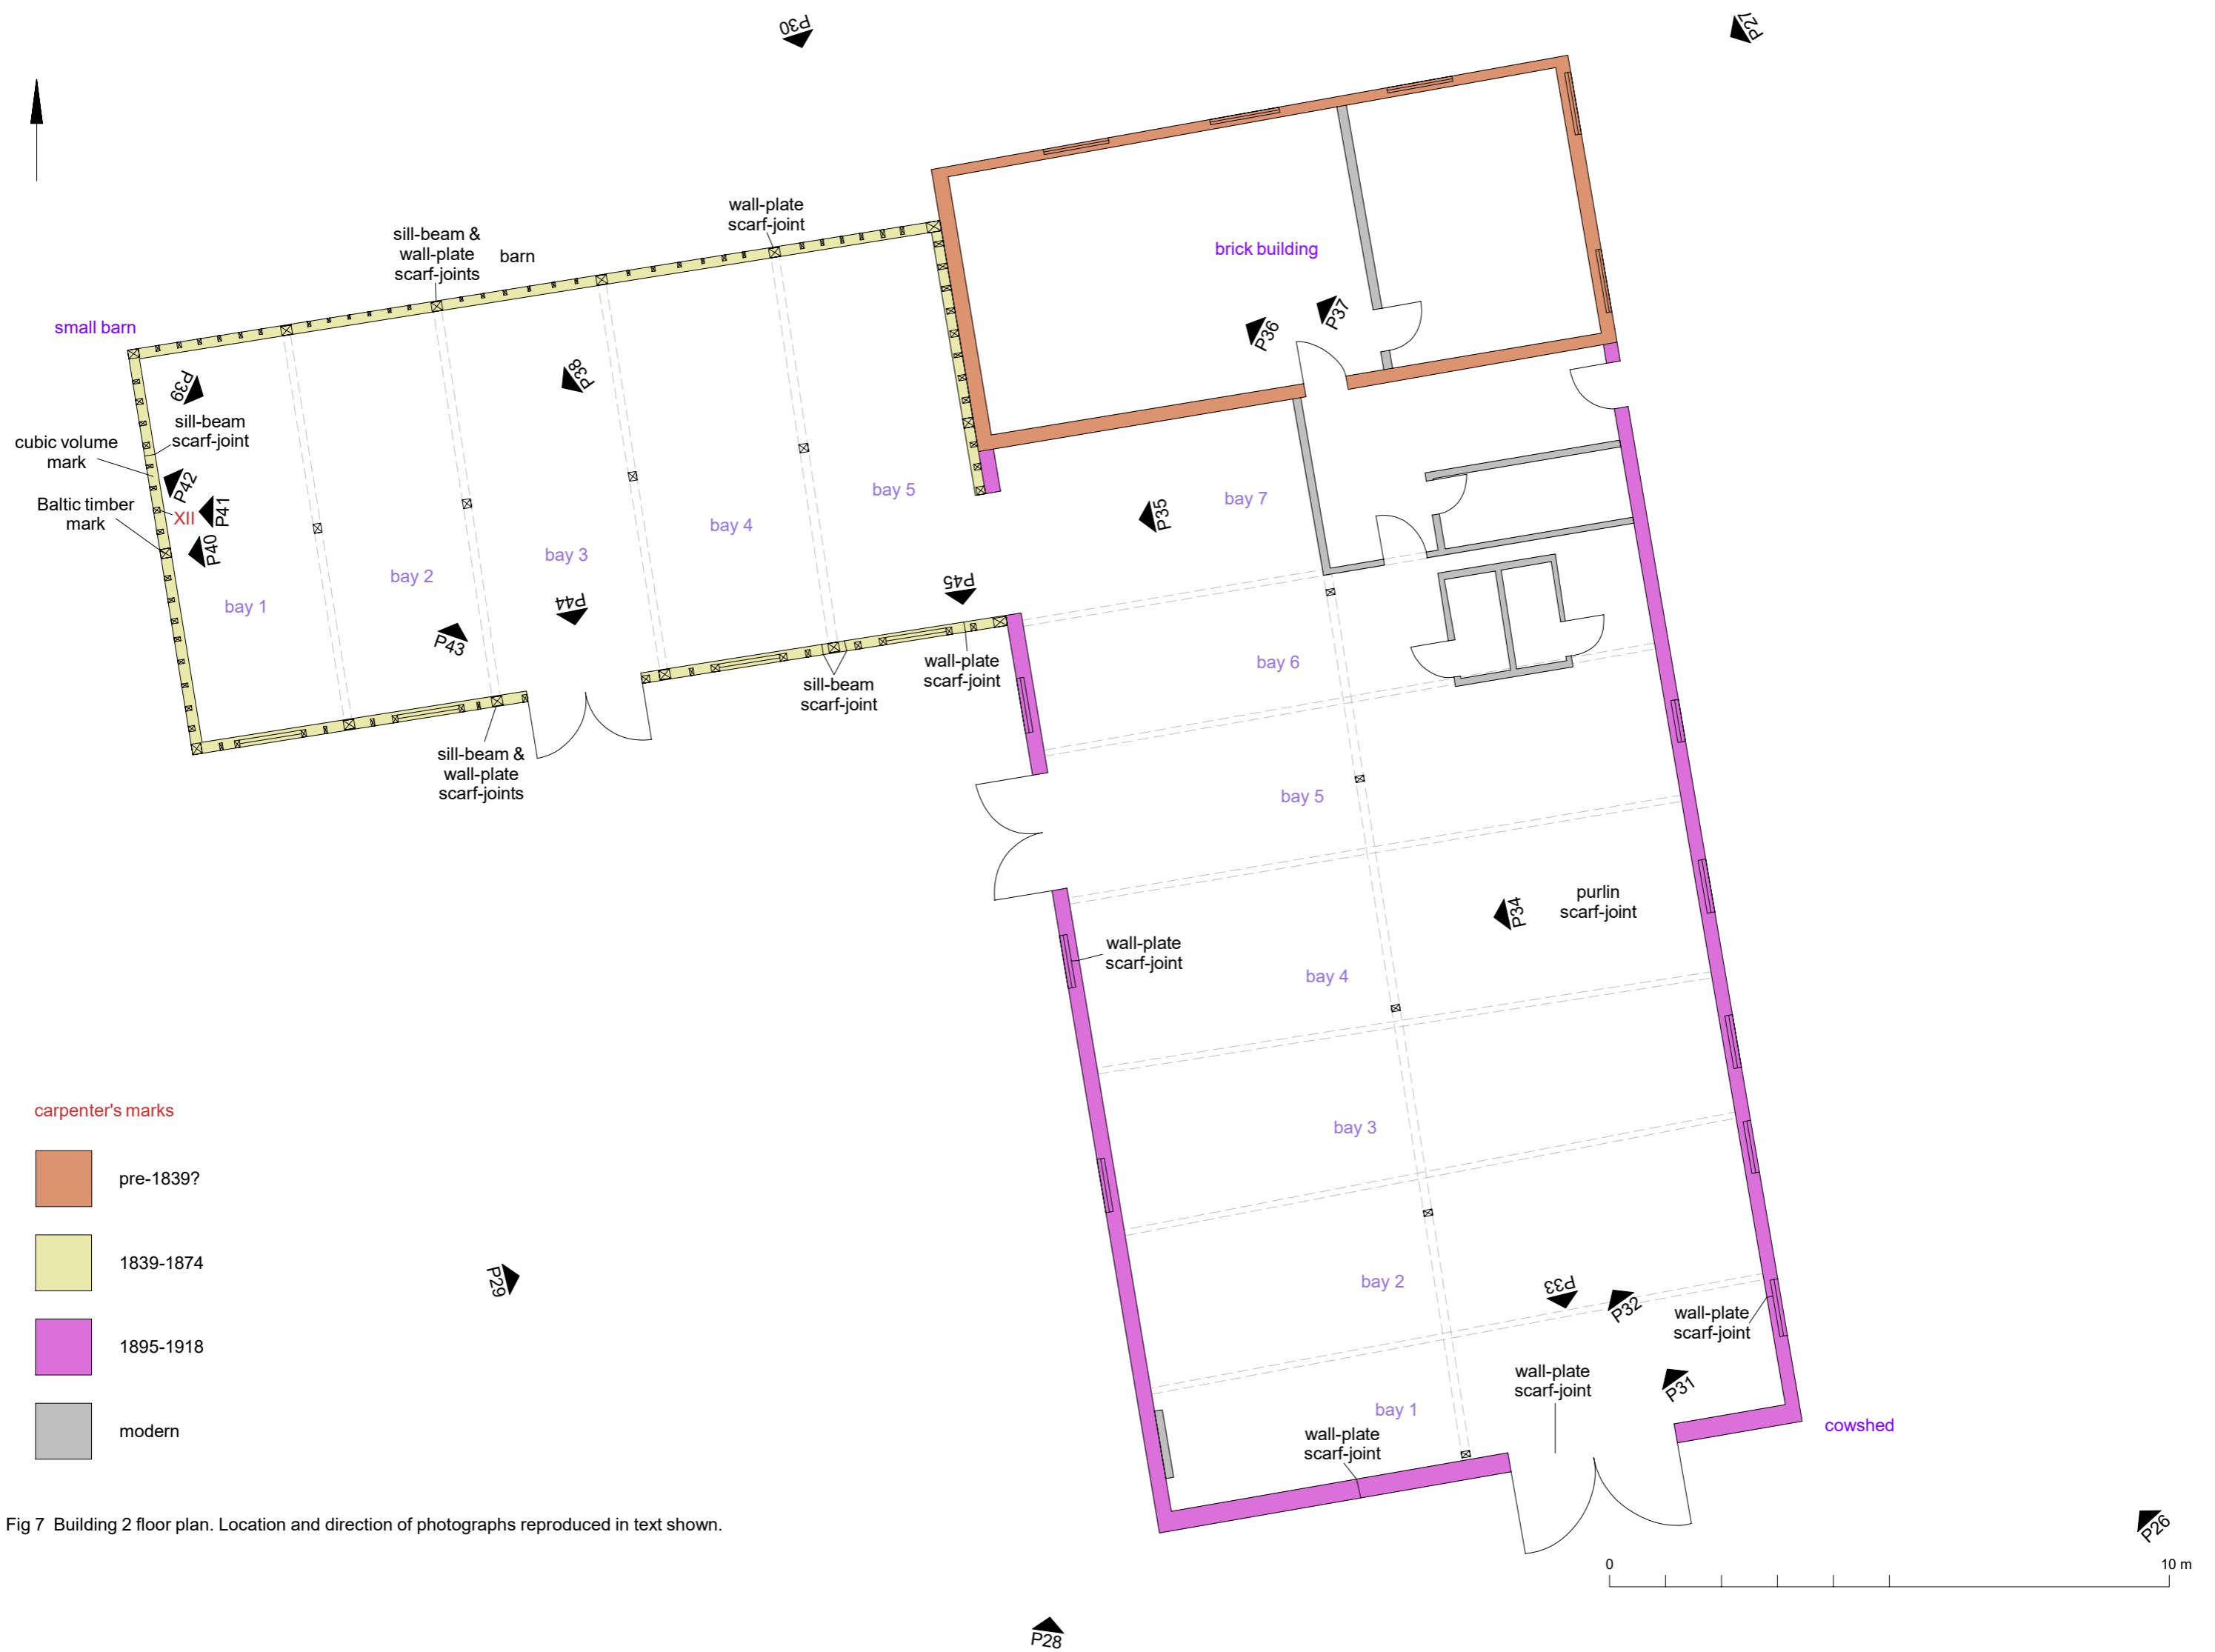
Building 2 floor plan. Location and direction of photographs reproduced in text shown.
